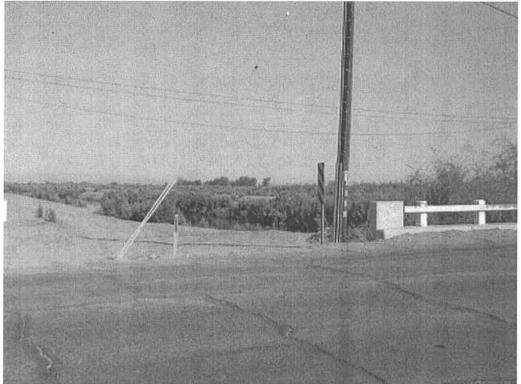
Photograph taken on the east side of Scaroni Road bridge, facing the northwest. Central Main Canal is at the center of the photograph.
